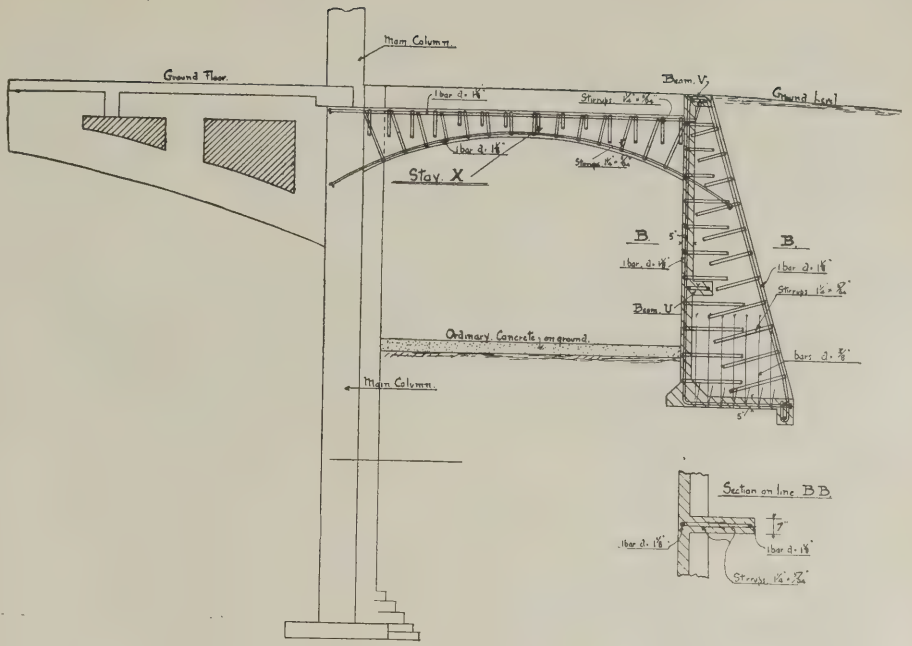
TYPICAL SECTION OF RETAINING WALL.
